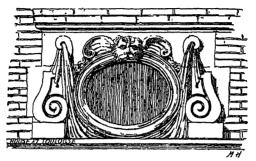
Bull's-Eye Window, House in Toulouse.
